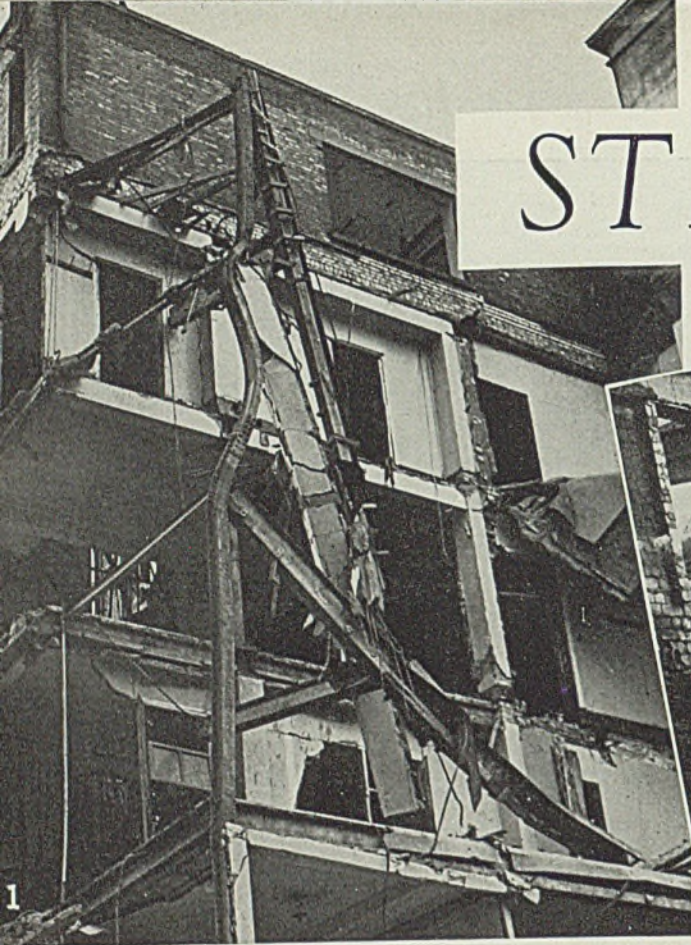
This shows result of not anchoring floor beams into a vertical steel frame
